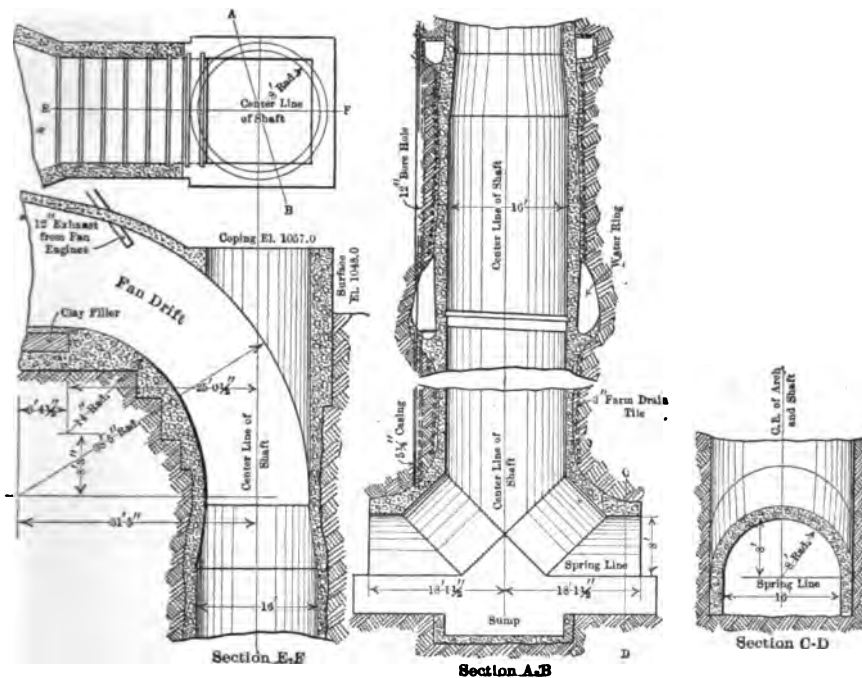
Concrete shaft support, colliery ventilating shaft. (*Eng. News.*)
